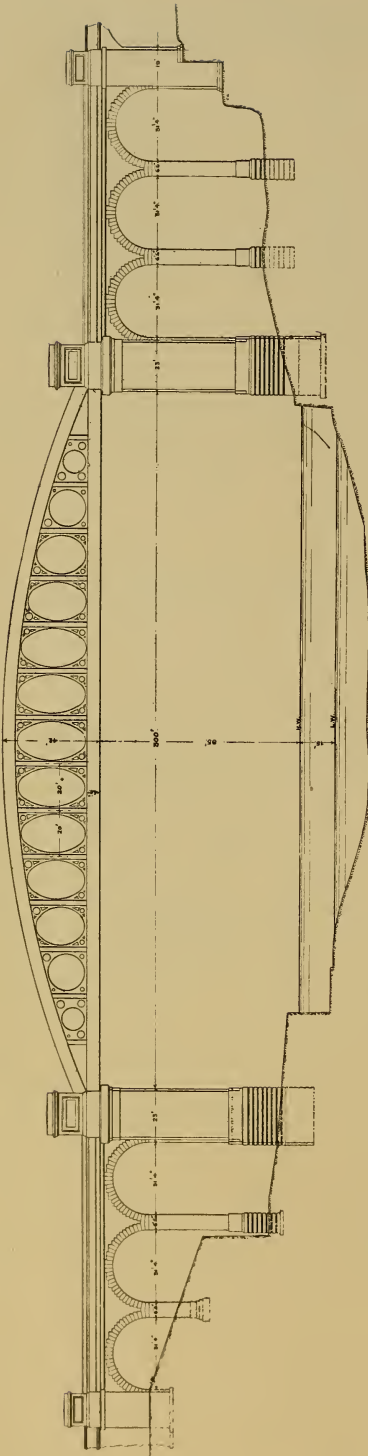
BRIDGE OVER RIVER WEAR AT SUNDERLAND. WROUGHT IRON GIRDERS. 300 FEET SPAN. T. E. HARRISON, ENGINEER 1879
